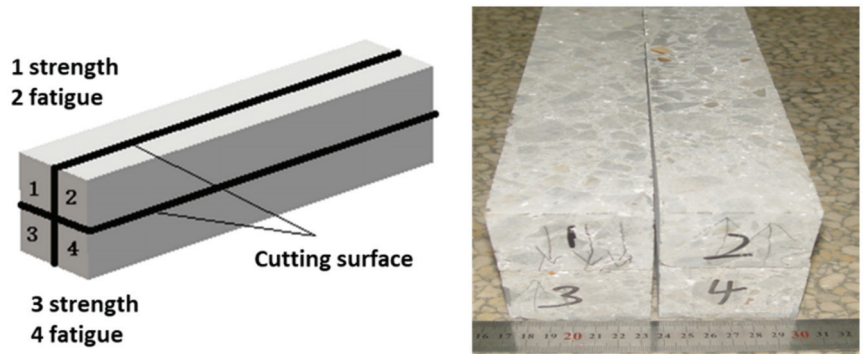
Testing beam specimens from a large beam specimen for the strength and fatigue test.
